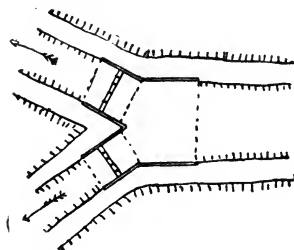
PLAN OF BIFURCATION, DEL NORTE CANAL.
